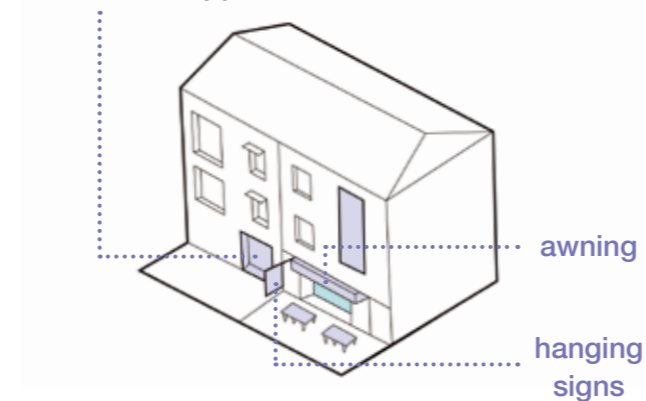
Hanging signs, shop awnings and occupation of pavement with chairs are acceptable.
